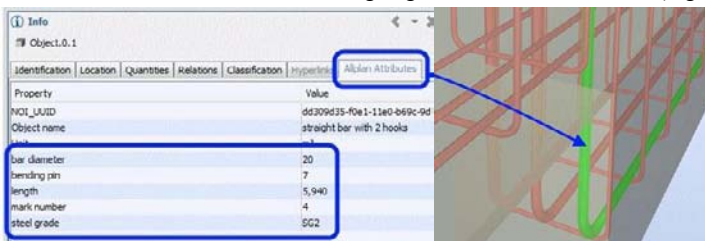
Allplan Engineer's Example of User-defined attributes for rebar
